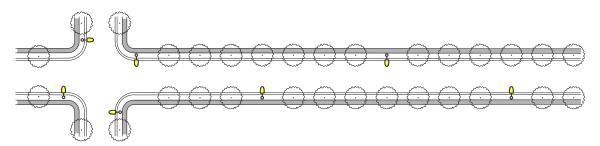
Typical Local Street with Non-Continuous Street Lighting Plan
